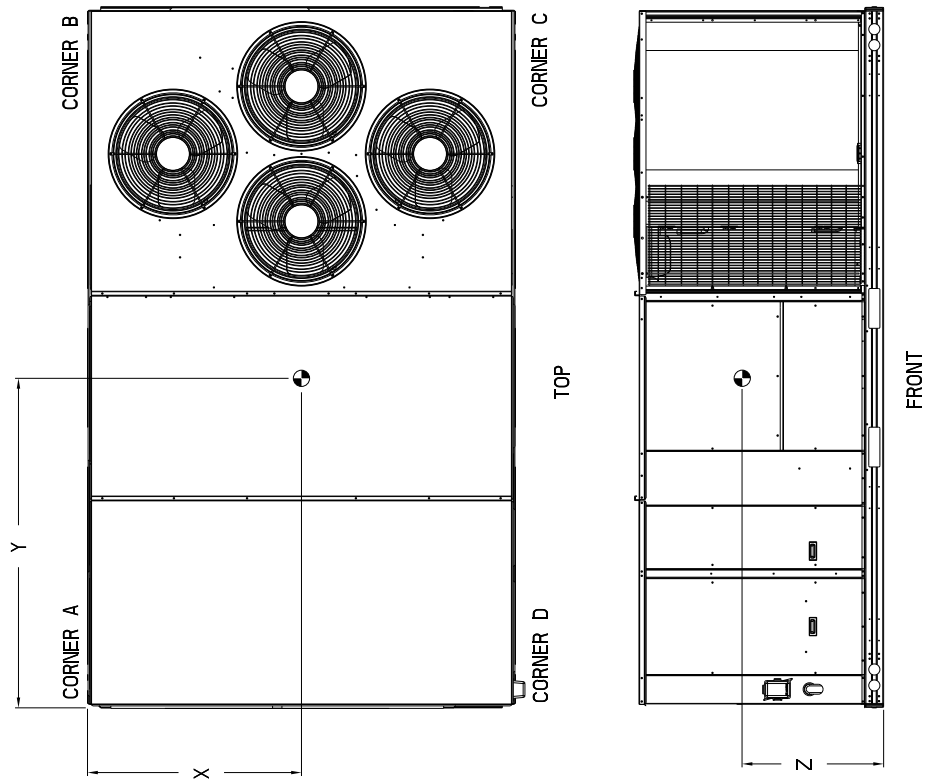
Unit Dimensional Drawing – Size 24 Units, Sheet 2 of 3
